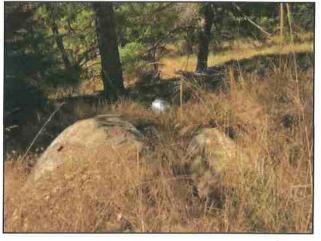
Private Access Rd @ 18" Culvert Out. Culvert In Was Not Found
